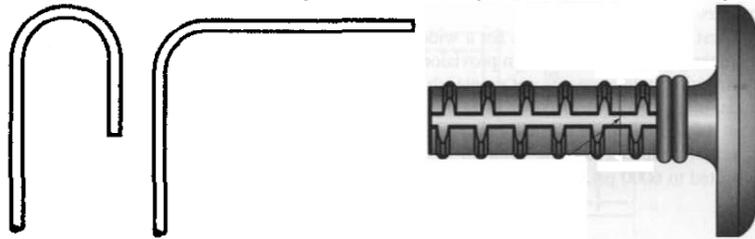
90° Hook, 180° Hook, and Headed Bar.
